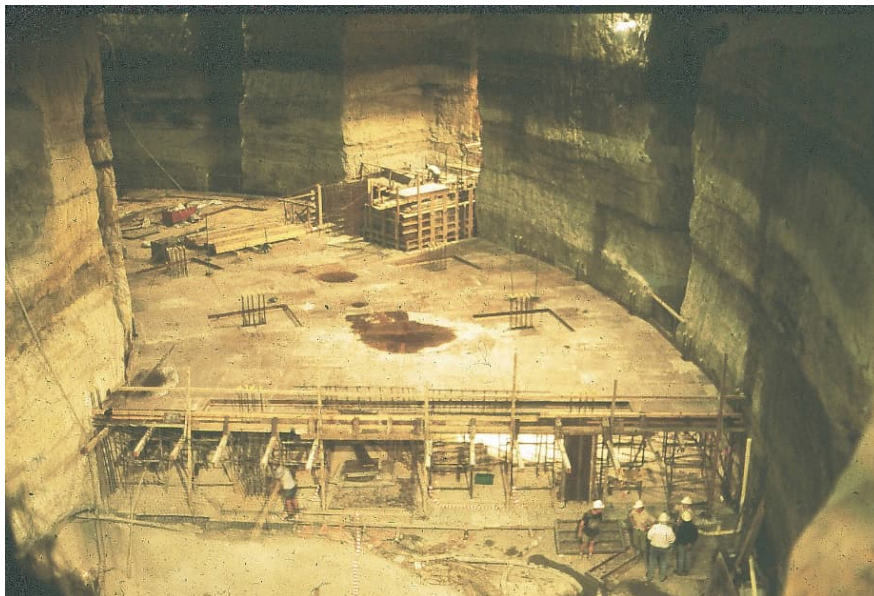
Commencement of the concrete double helix; stairs and lift structure being built in the slot
